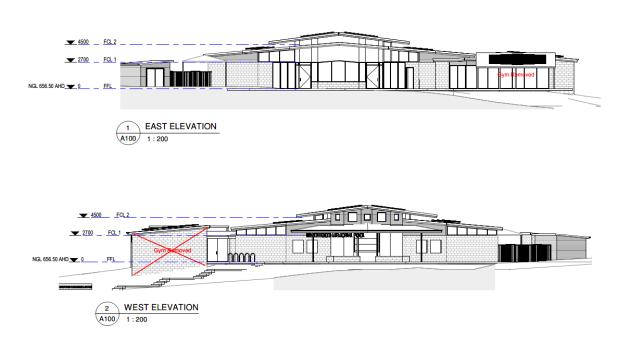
and 5: East and West Elevations (Prepared by Paul Barnett Design Group)
